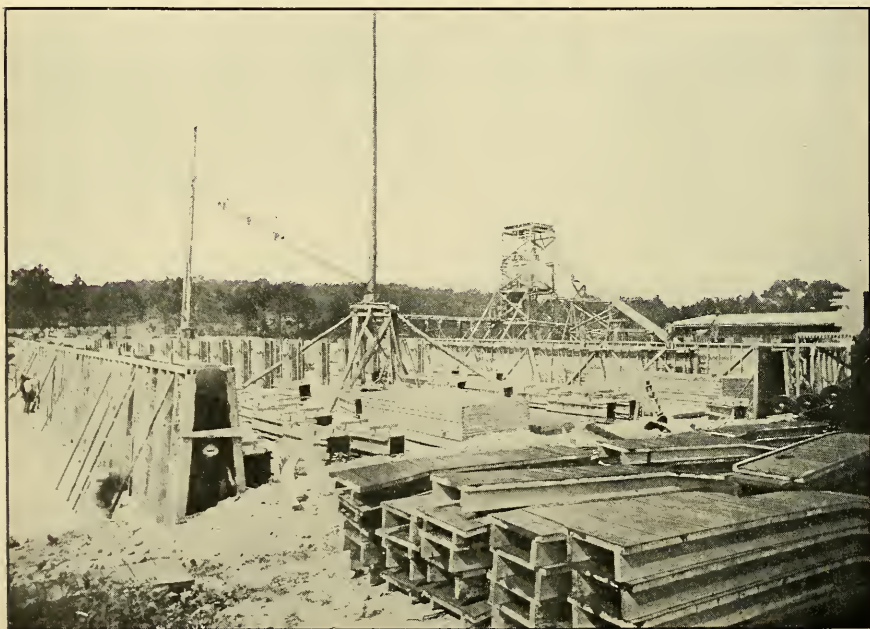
METHOD OF PLACING FILTER WALL CONCRETE.
